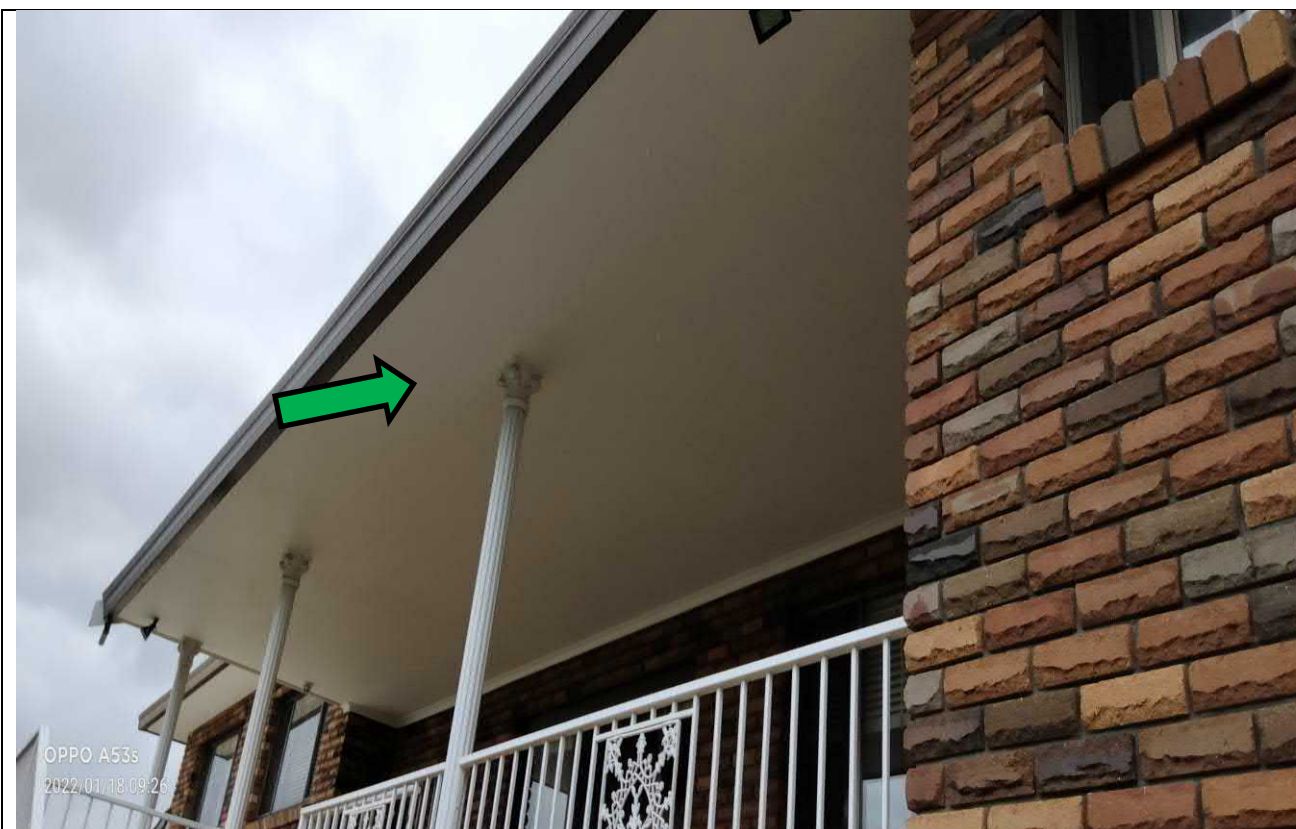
Main building, eaves and awnings, non-asbestos containing fibre cement sheeting, as observed on 18/01/2022.
